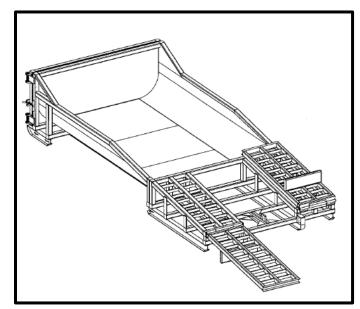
Prefabricated Concrete Washout Container with Ramp.
